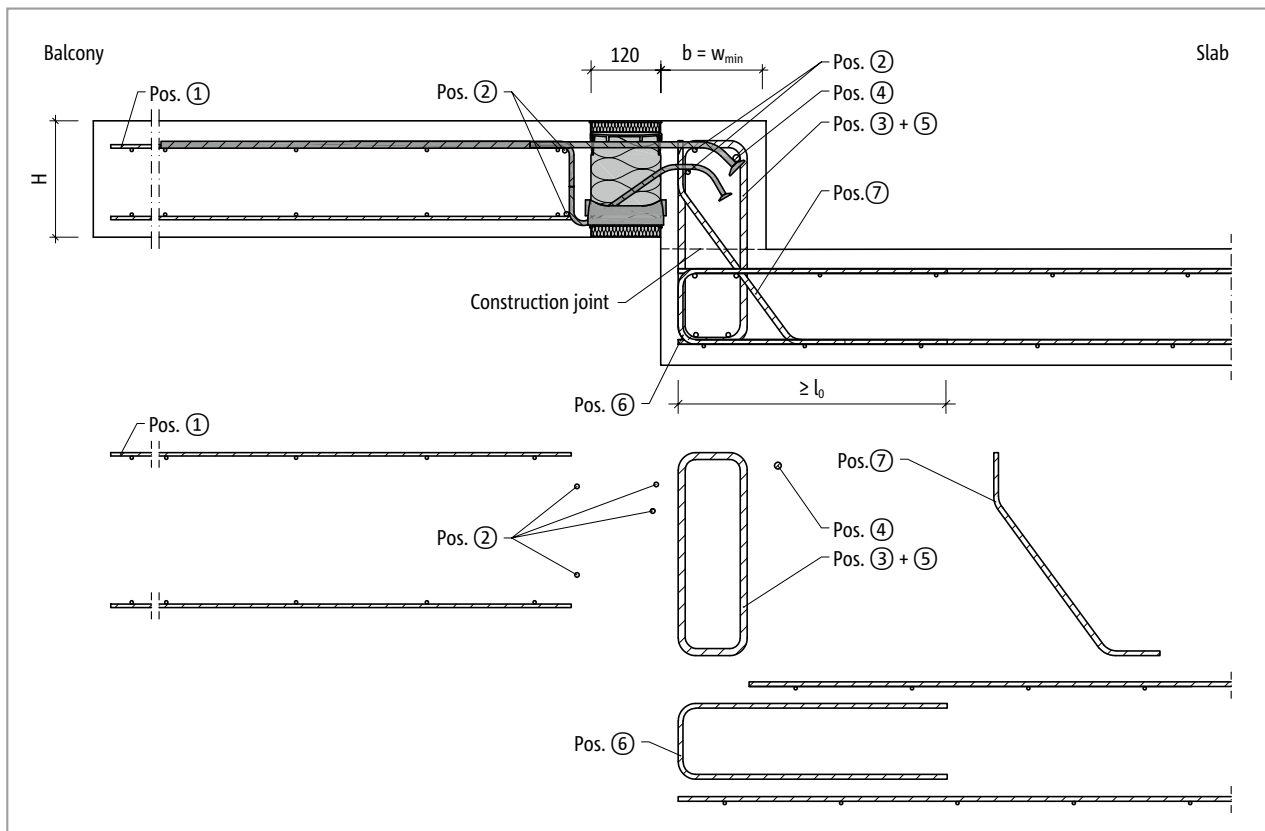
Schöck Isokorb® XT type K-O: On-site reinforcement for balcony with height offset upwards with minimum structural element dimension ( $w_{vorh} = w_{min}$ )
